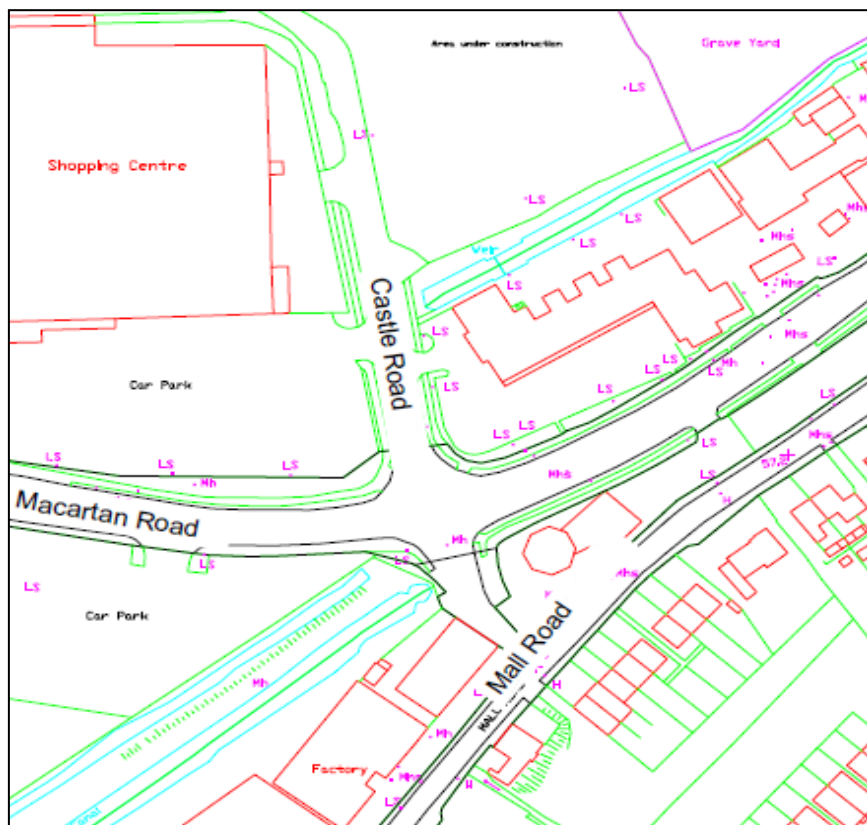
Mall Road/ Castle Road/ Macartan Road Junction
